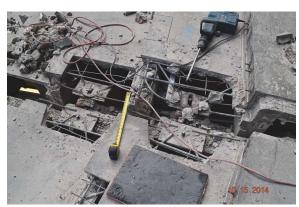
Typical Precast Joint Repairs—Water leaking through building expansion joint between precast seating sections was absorbed by mineral wool fireproofing in the joint, resulting in severe deterioration. Large steel plates are seismic restraints.
